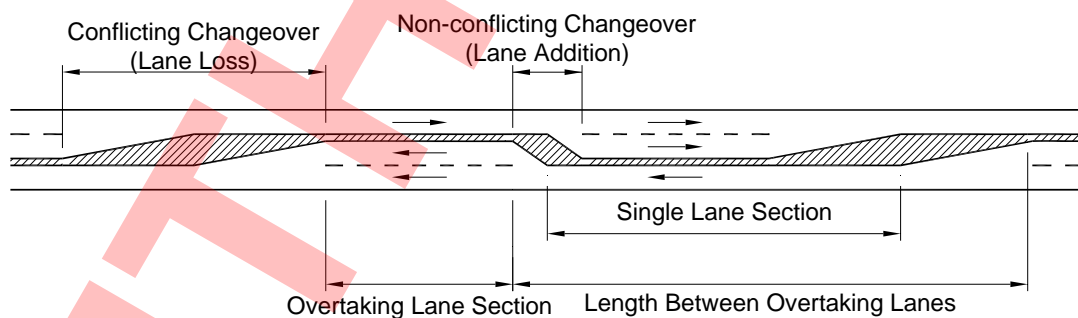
/1: Typical Layout of a WS2+1 Road with Changeovers
